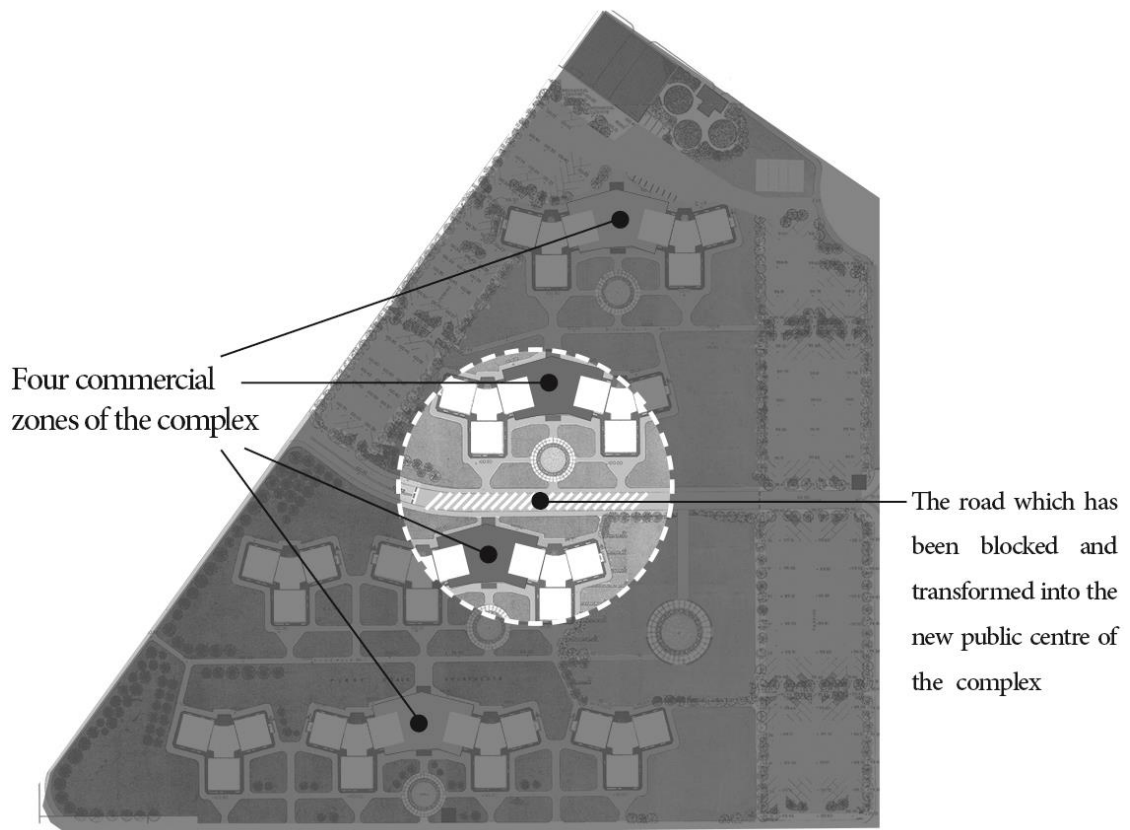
Schematic plan, the new centre of the complex. Source: Author
